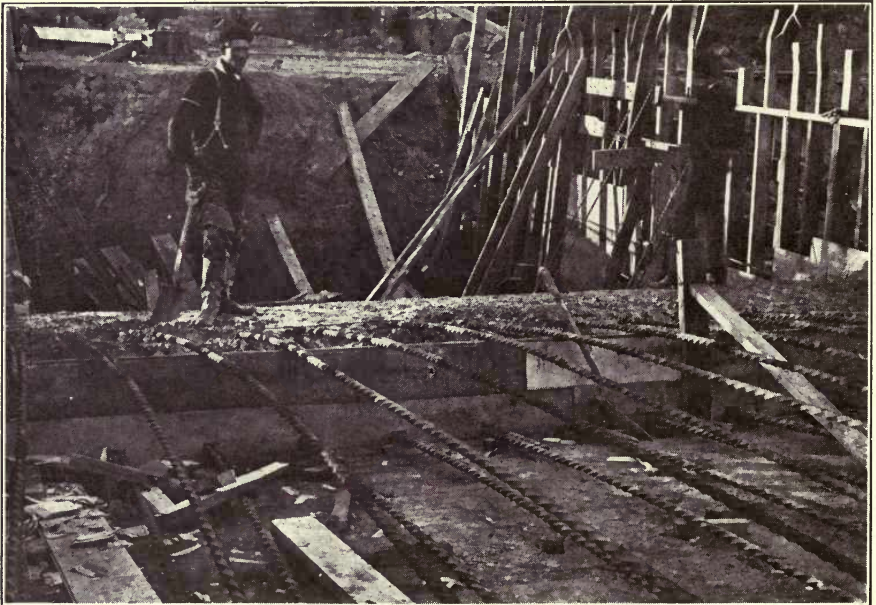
CONSTRUCTION OF ARCH BRIDGE, ELM STREET, CONCORD, MASS.
